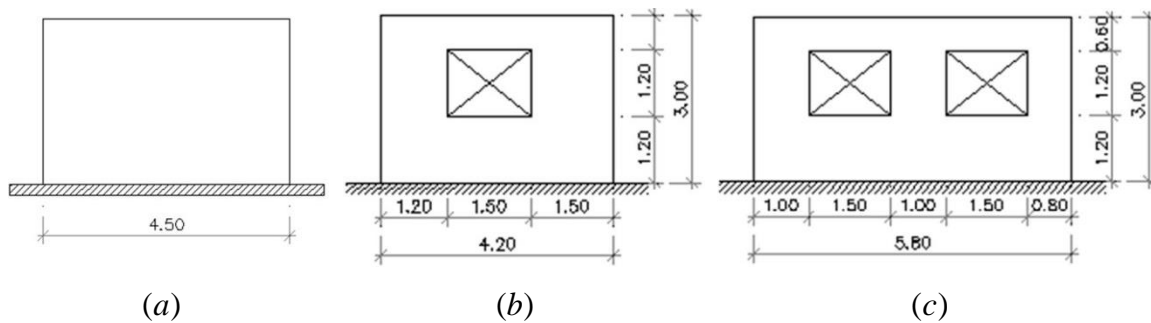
Geometry of three different types of masonry infill walls subjected to blast loading: (a) Type A; (b) Type B; (c) Type C [51].
